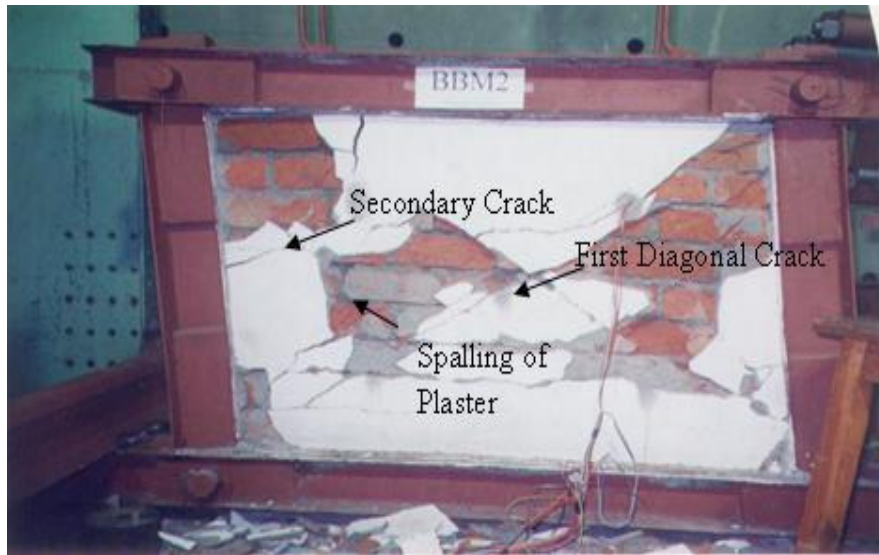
Failure Mode of Infill Wall with Air Gap under Cyclic Loading.
